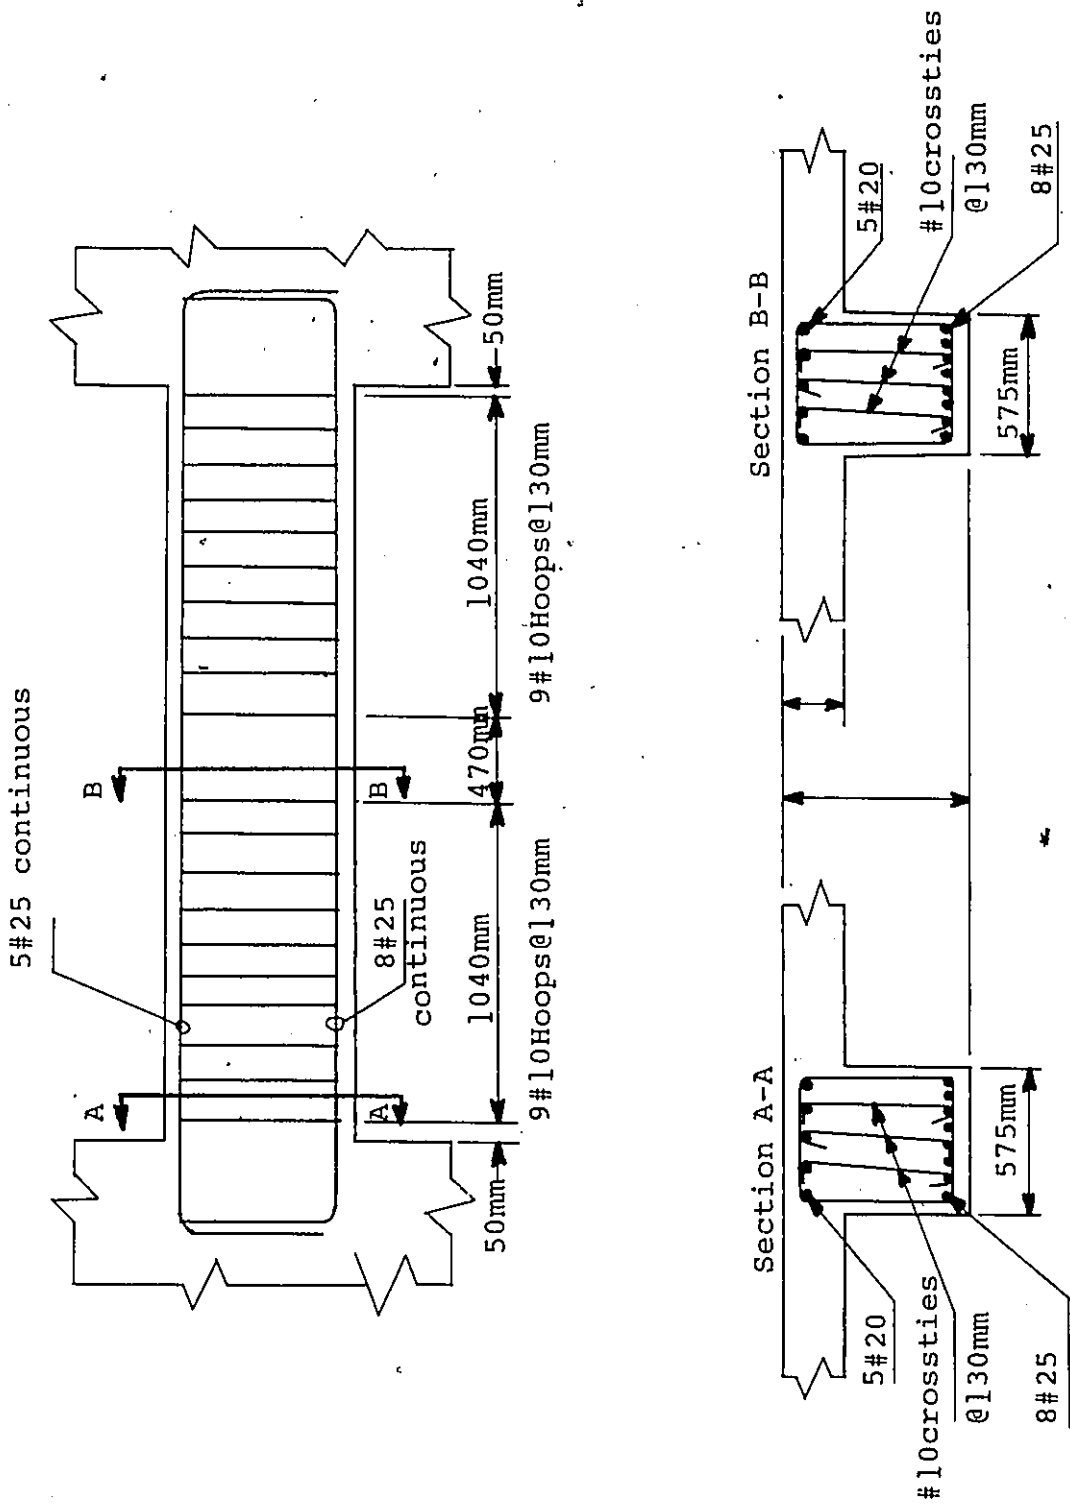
Shear Wall Coupling Beam (for both codes)
